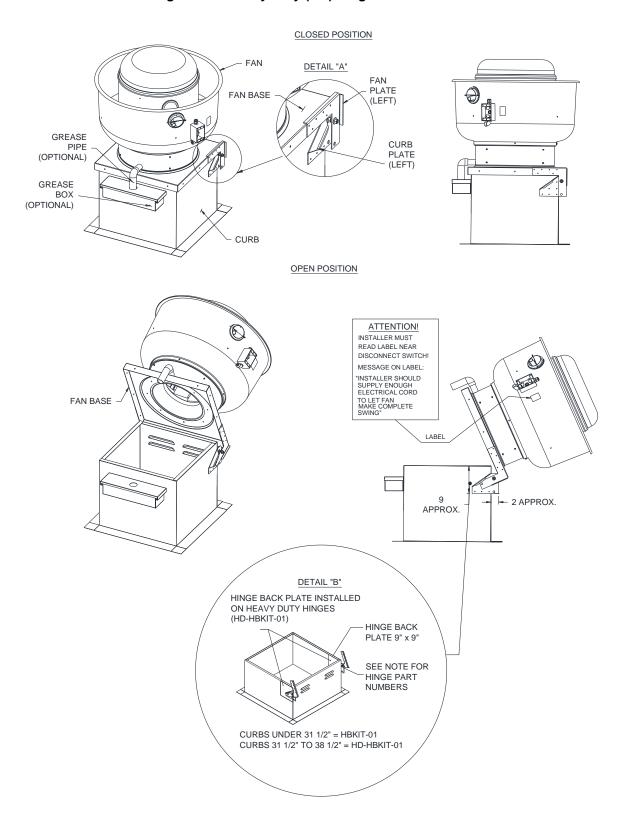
Heavy Duty (HD) Hinge Kit Installation Details
